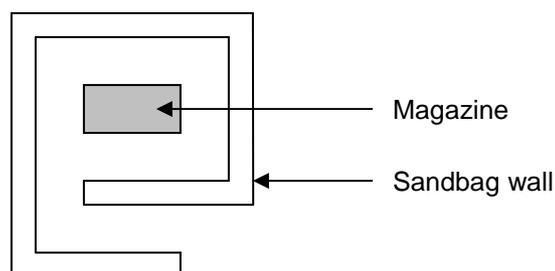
Plan view of sandbag wall surrounding indoor magazine
